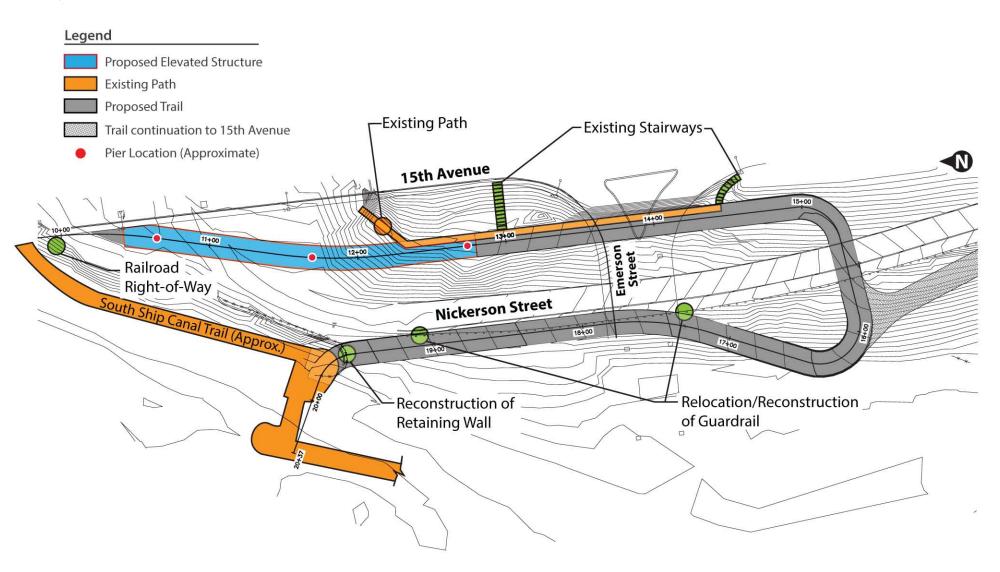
Emerson Underpass Trail - Constructability Issues
